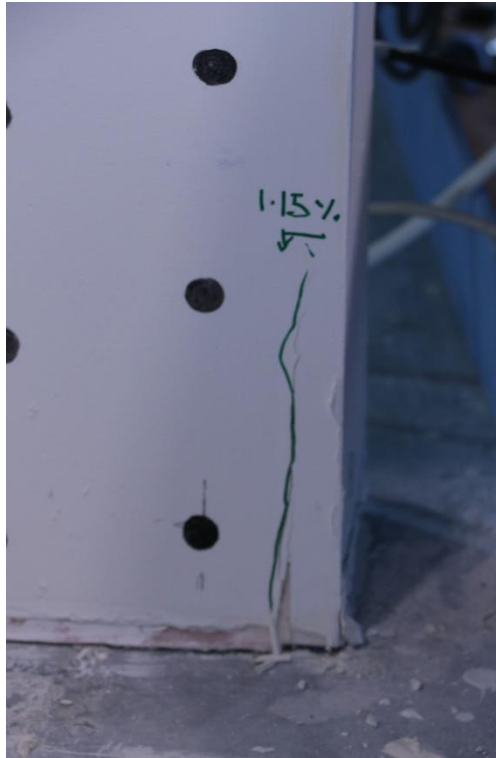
Specimen B1 – Step 11 – DS1b: Plaster cracking along L-trim at bottom corner of wall end- location 1/21
